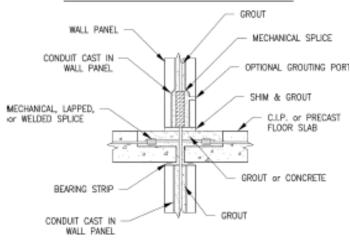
Vertical bars in conduit are spliced and the system is grouted. (Procedures: (1) wall panel is erected, but held high; (2) loose vertical bars in the panel being erected are spliced to protruding bars from below; (3) panel is lowered to correct elevation; and (4) conduit is grouted by gravity flow from top or through optional grouting port from bottom of panel.) (Note: Welded and lapped splices must be located more than 2h [where h is floor thickness] from the face of wall. Mechanical splices must be Type 2 if less than 2h from face of the wall.)
